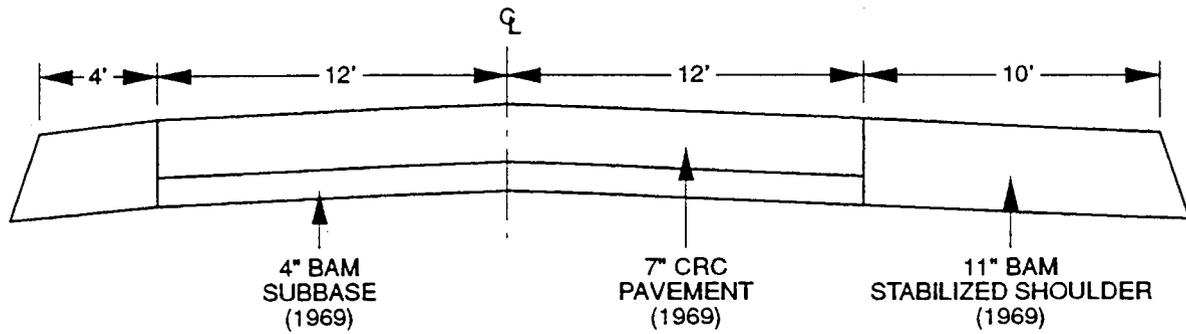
Original Pavement Cross Section - Full-Depth AC Inlay.
